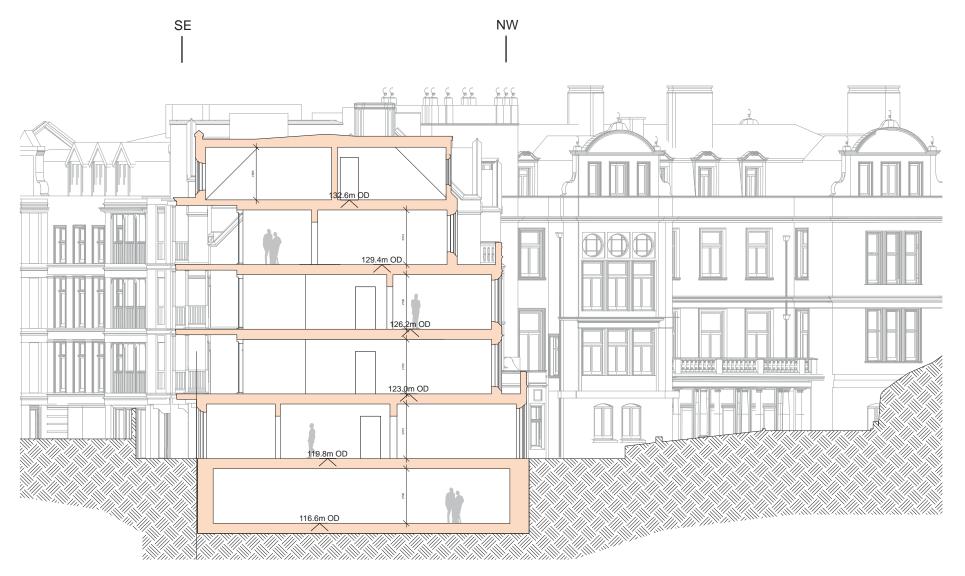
North-east facing section of centre of proposed extension (Stanhope Gate Architecture, Section C–C, dwg. PL-26, Dec-2019)
